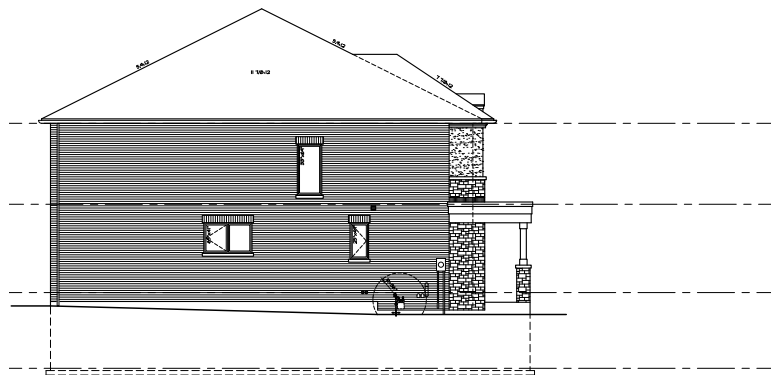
Front-Loaded Townhouse Left-Side Elevation
